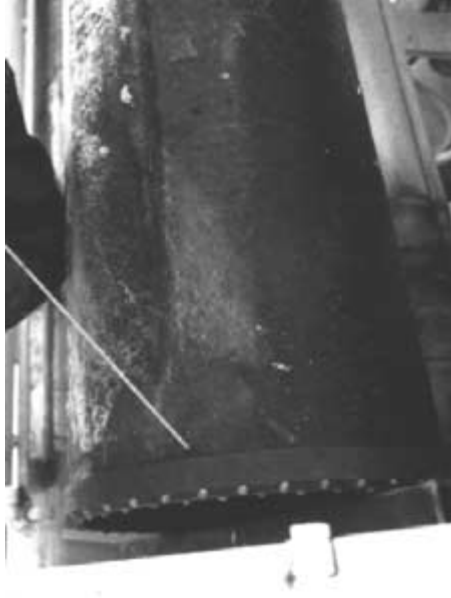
Casing shoe ring drag type bit (carbide studded) welded to the bottom of the casing (courtesy of Foremost Industries Incorporated).
